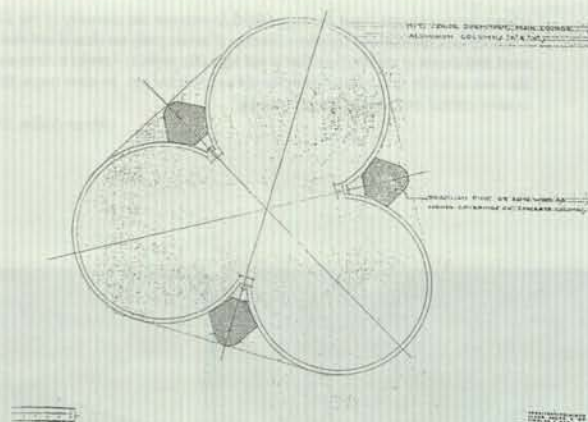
Trefoil Column covers - main lounge plan detail (A.A. Archive - no date)
